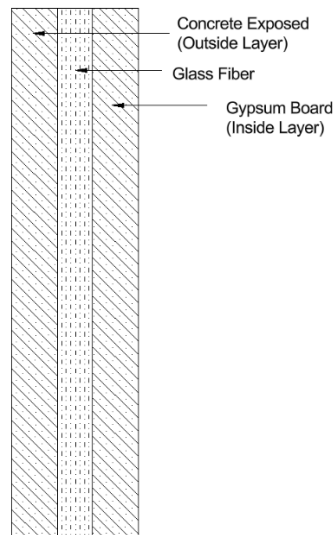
The Construction Design for the Montpetit Hall Exterior Wall
